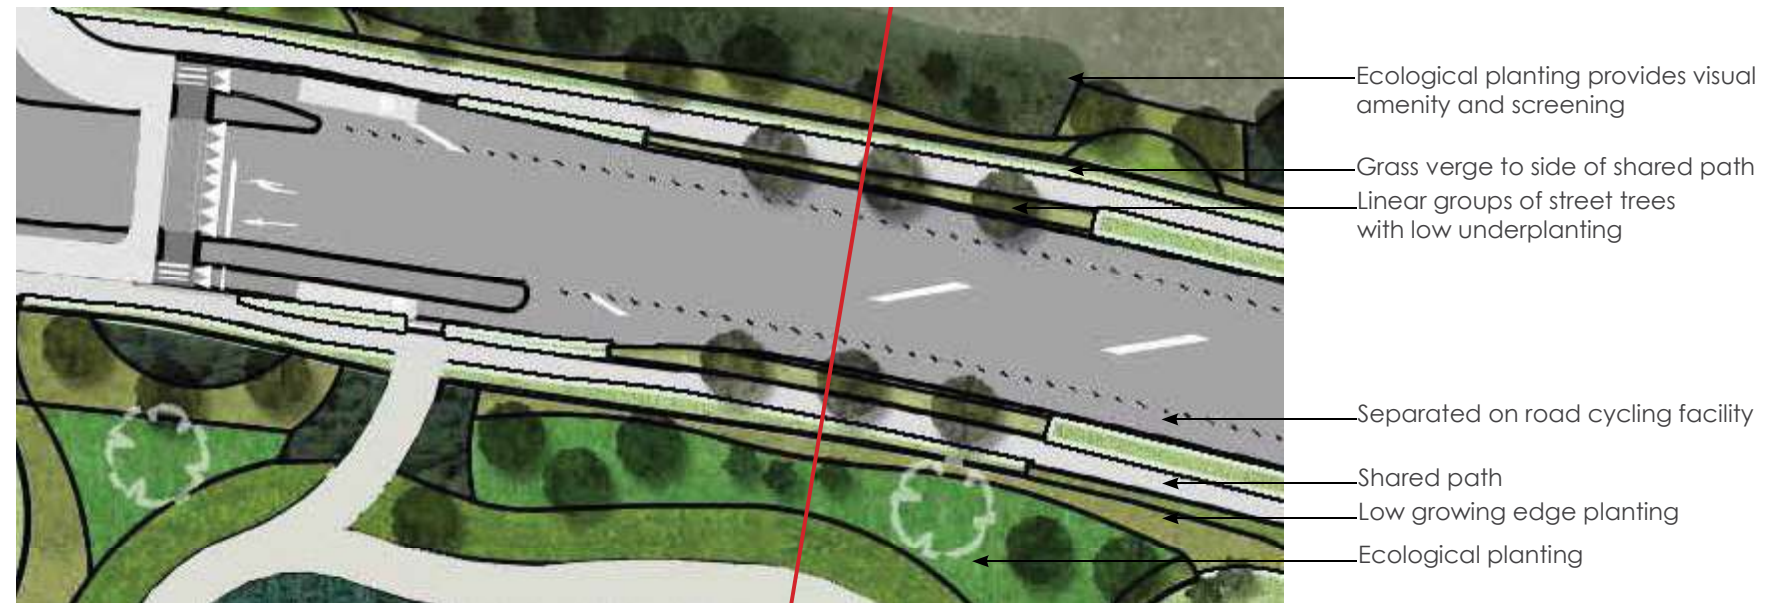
TYPICAL WHATUKOORURU DRIVE STREETSCAPE
